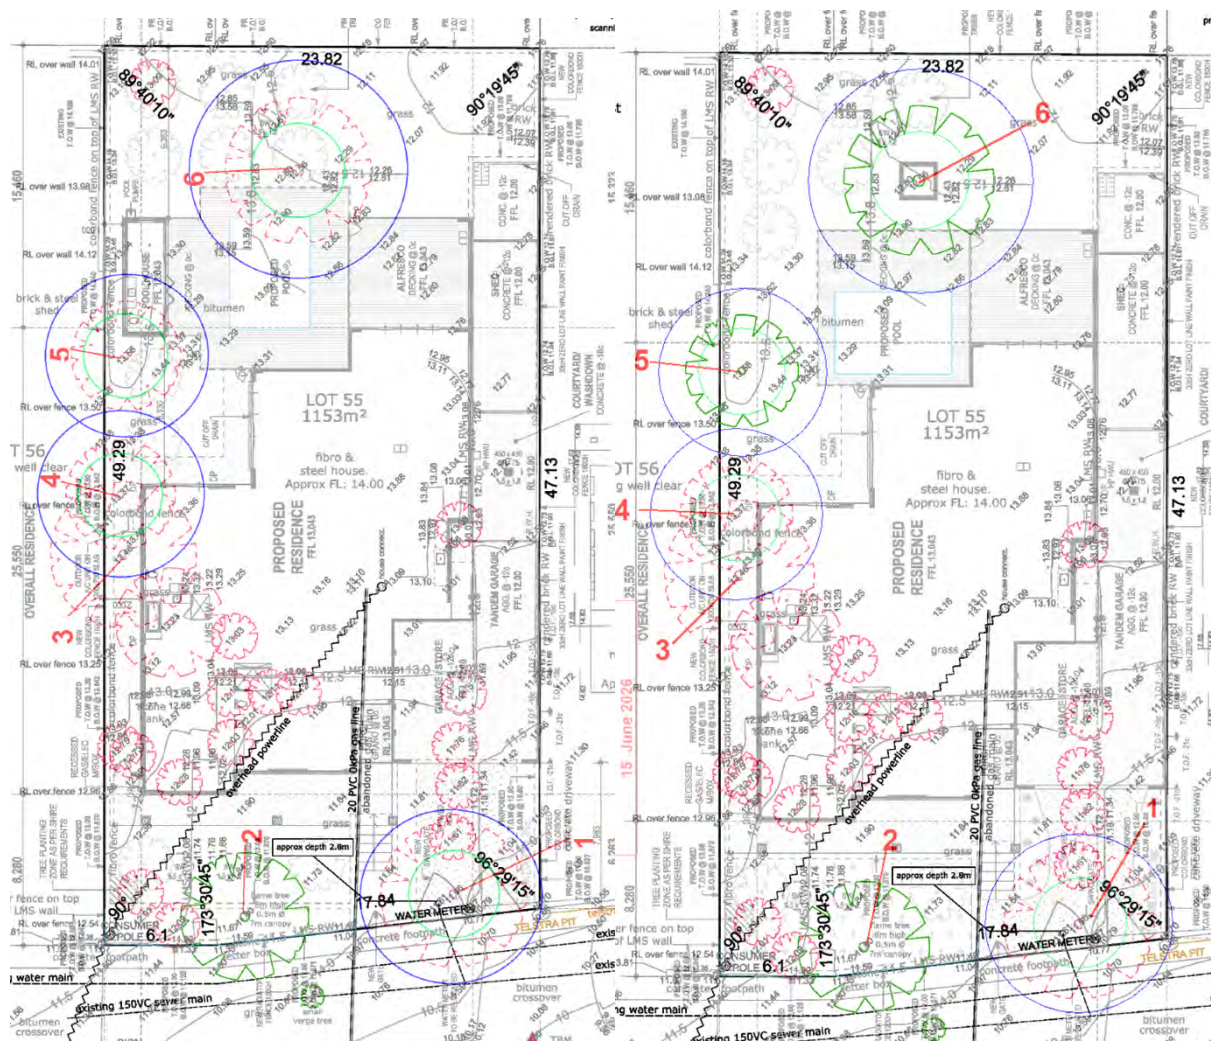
Previous plans (left) and amended (right) Identified regulated trees overlayed on proposed single house
